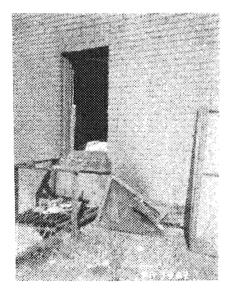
Exit from third floor window leading to wood staircase. Note the wooden plat-form at the window and the screen.
